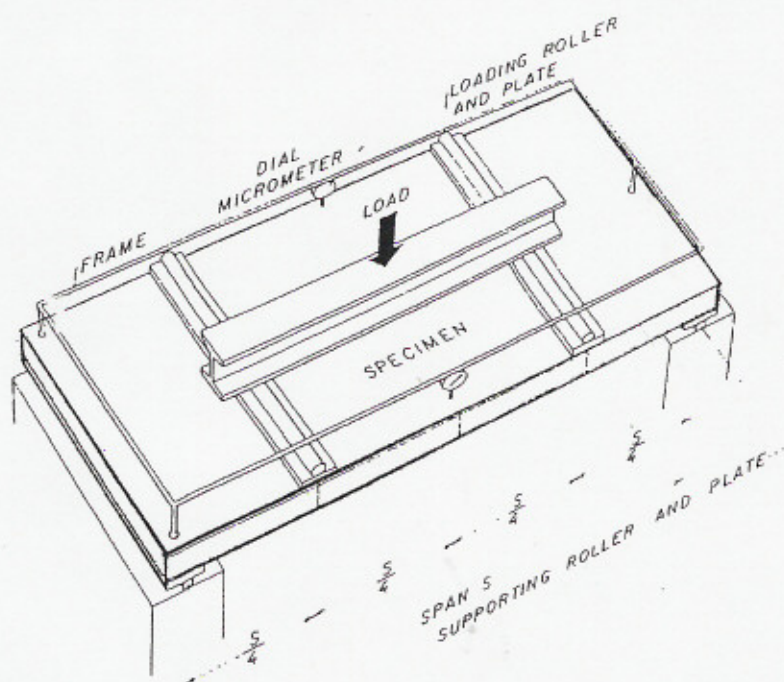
Test Setup for Transverse (Flexural) Loading (from "ASTM E72-98, Fig. 3")
